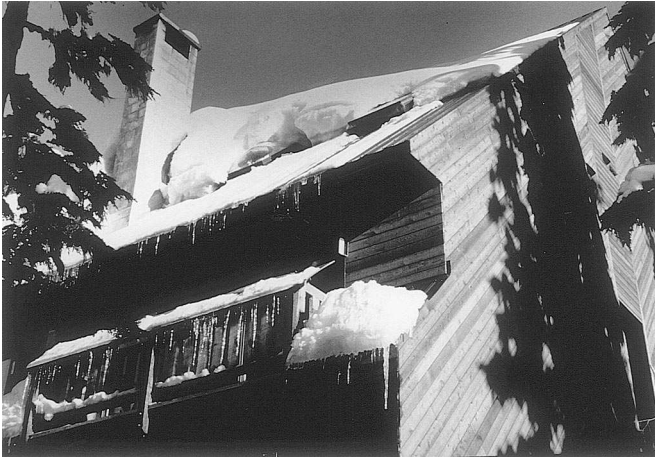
Overhanging snow falling into balconies is a danger to the structure and to people.
